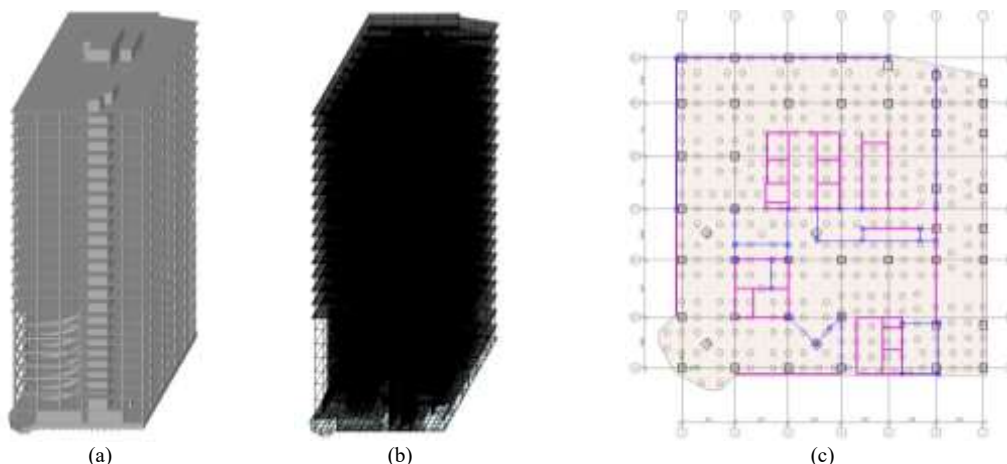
(a) 3D scheme; (b) design scheme in SCAD; (c) basement floor plan, formwork of the monolithic raft foundation and pile field
